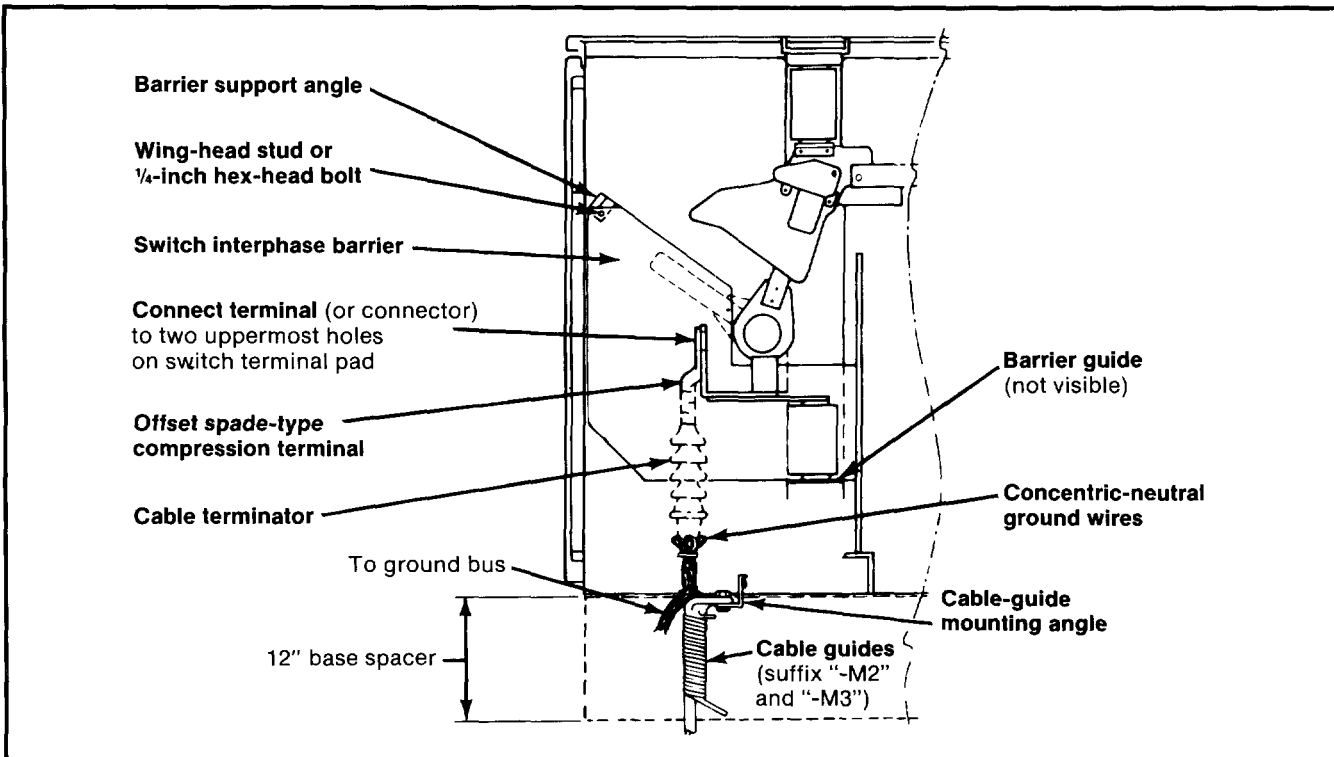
Side view of switch showing interphase barrier attachment points, terminal-pad connections, and optional cable supports. Illustrated above is an installed unit of pad-mounted gear with an existing 12-inch base spacer.
